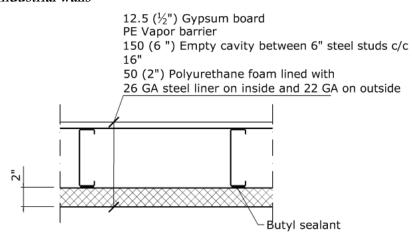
Horizontal cross section of the selected panel wall system, SPS.
